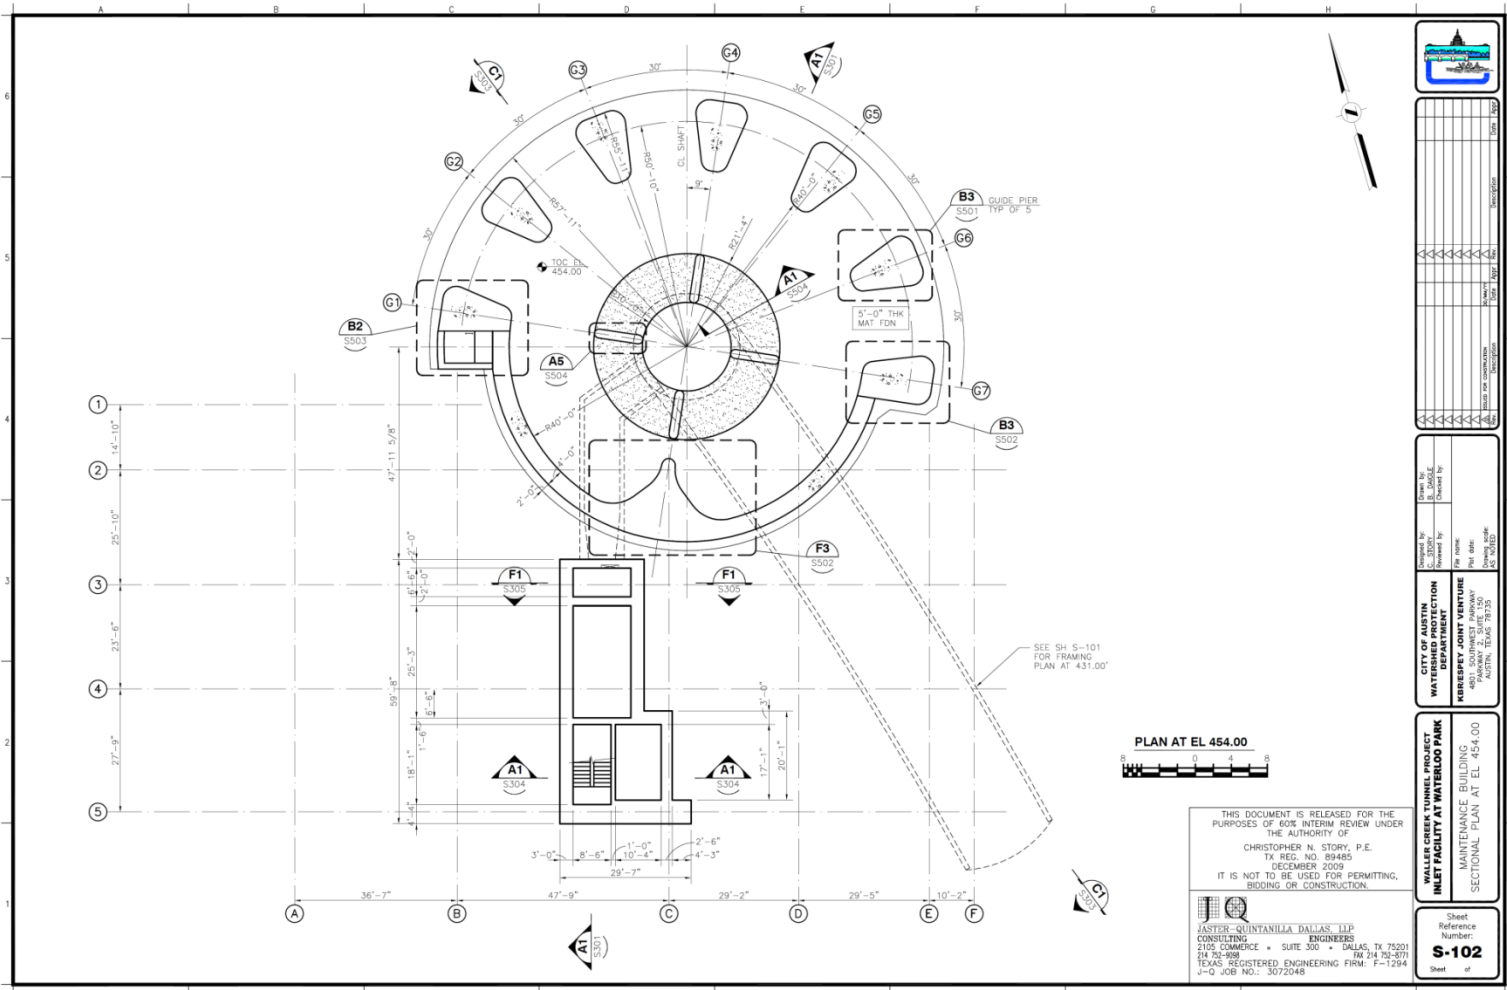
Waller Creek Tunnel Project; Morning Glory Spillway – Plan at EL 454
